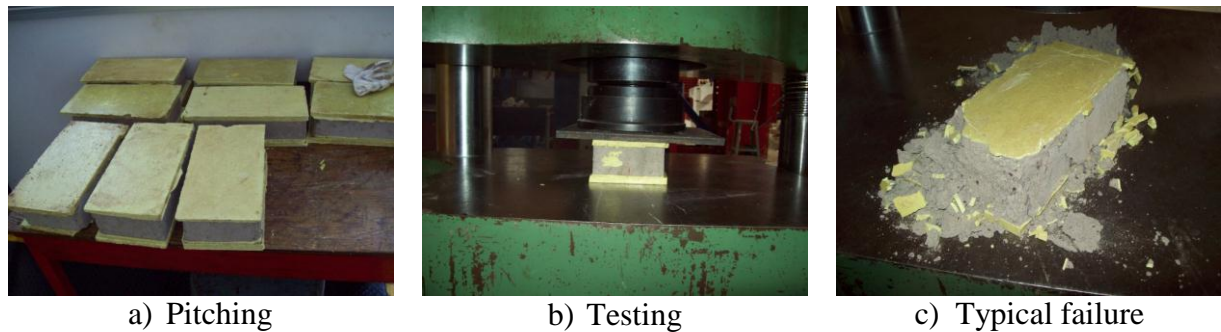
Compressive test of solid concrete building bricks made with tezontle-sand 30-70 mix
